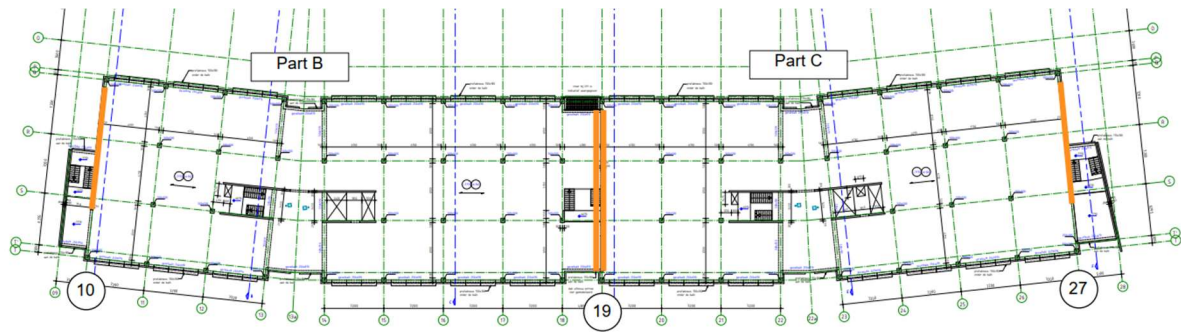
Shear walls in transverse direction (Pieters Bouwtechniek B.V., 2018a)
